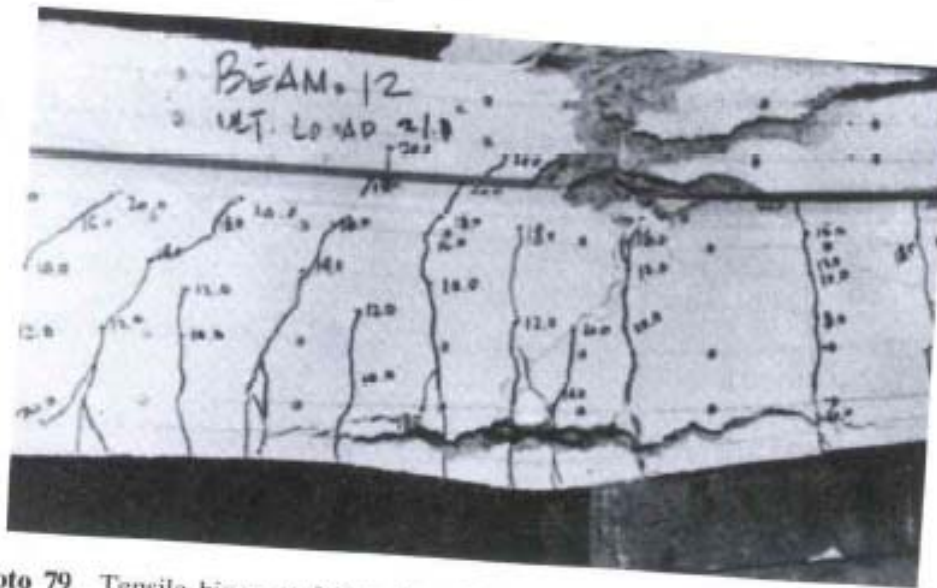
Tensile hinge at failure in a T-beam with rectangular confining reinforcement. (Nawy and Potyondy.)
